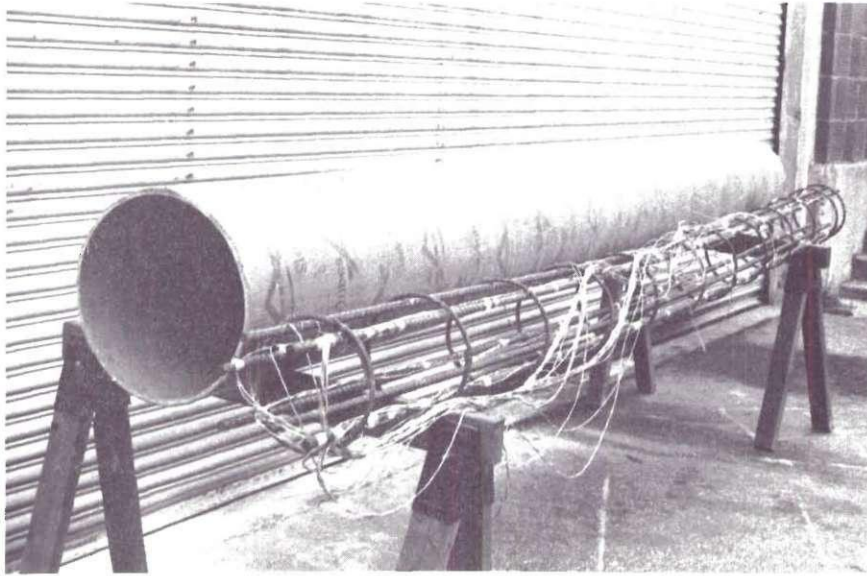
Reinforcing Steel and "Sleek Tube" Form
